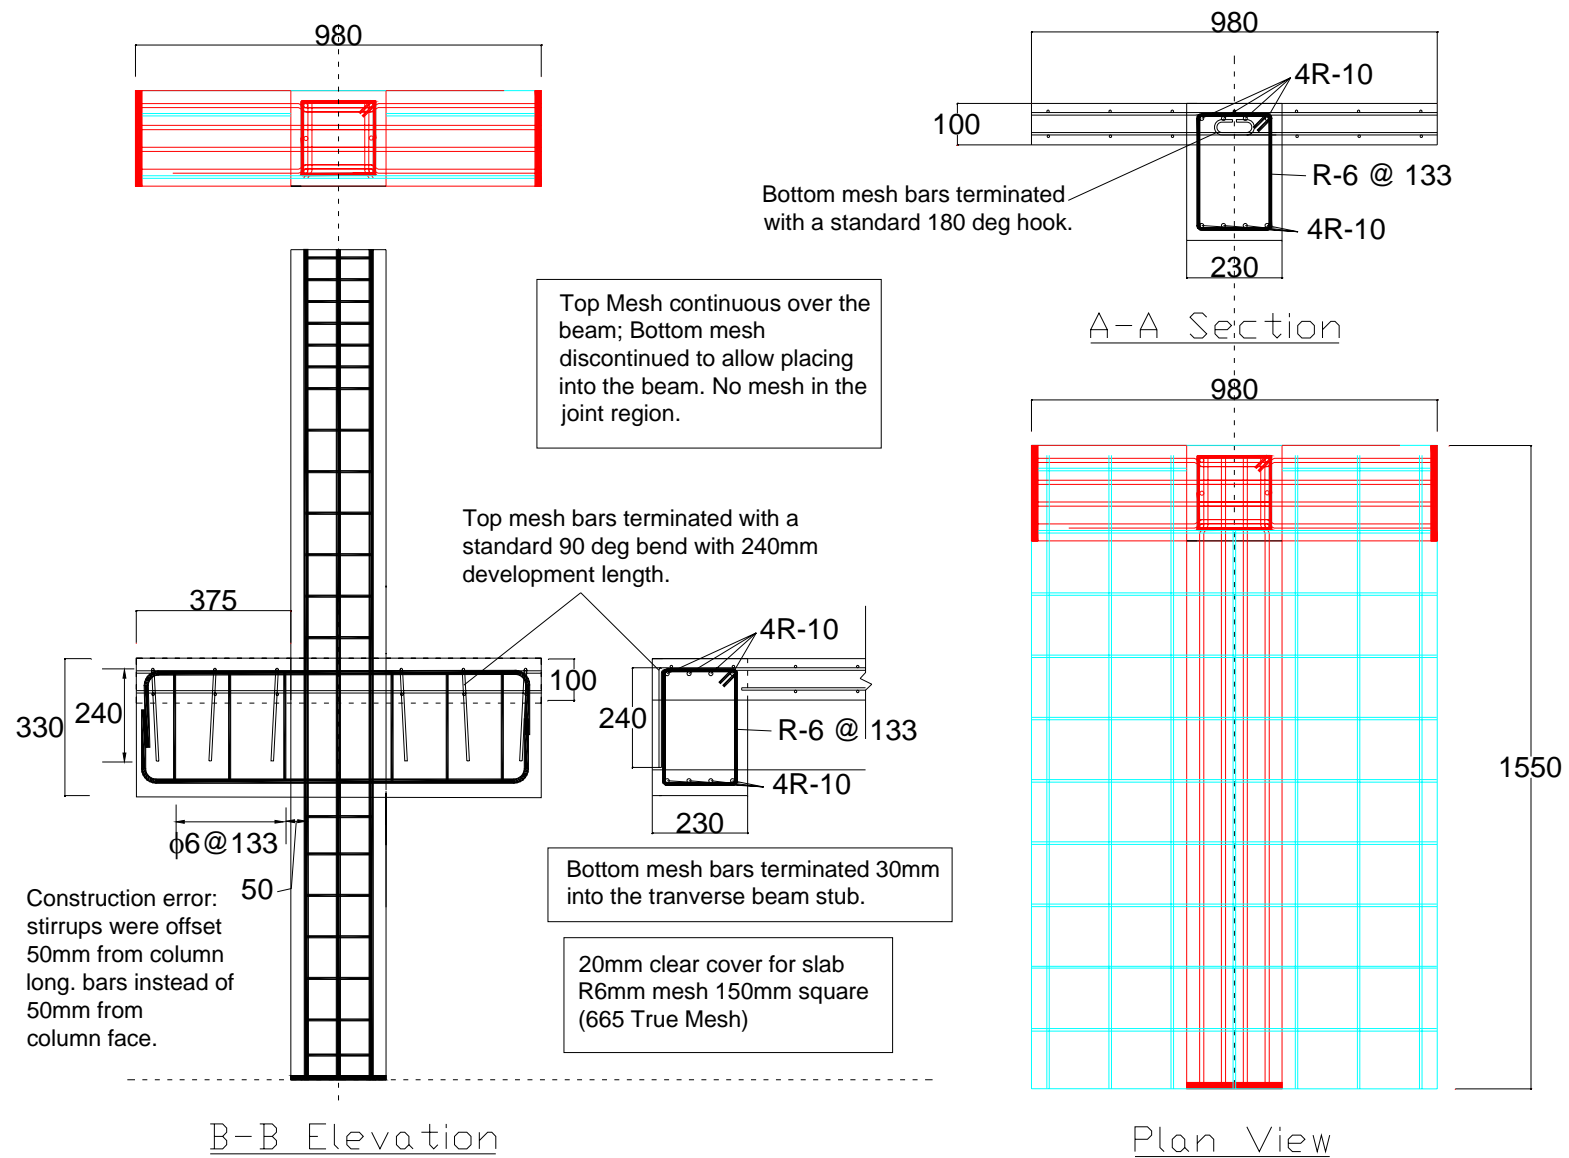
Reinforcing and geometry details for test units with slabs – SL-O1 and SL-R3 – part 2.
